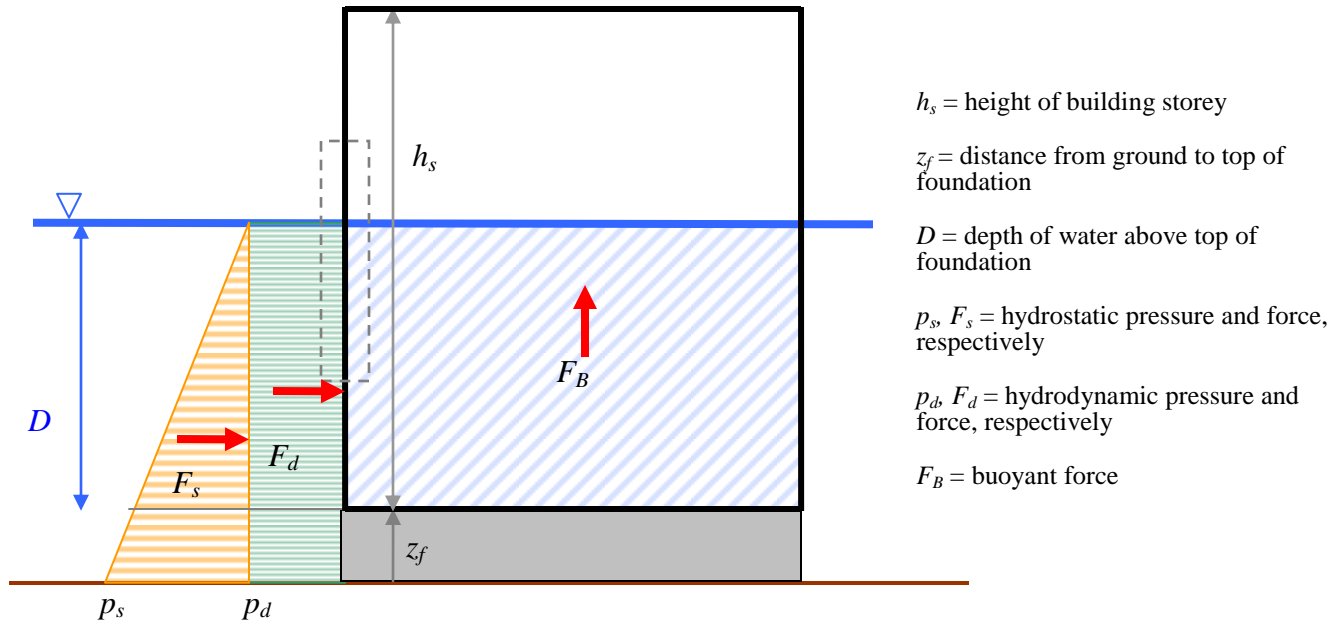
External hydraulic forces on low-rise building due to floodwaters
